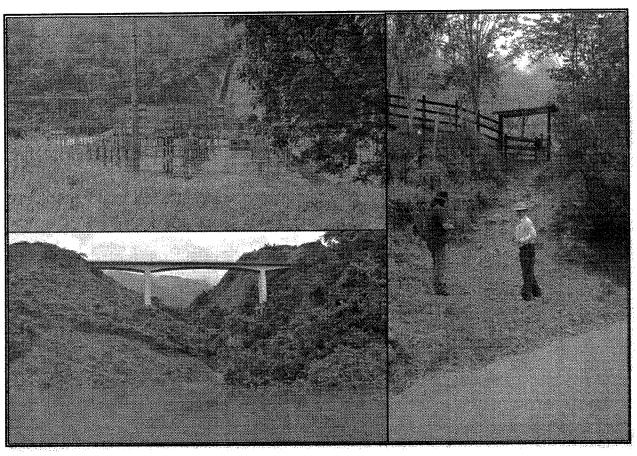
SANTA ELENA PROJECT SURROUNDING INFRASTRUCTURE
